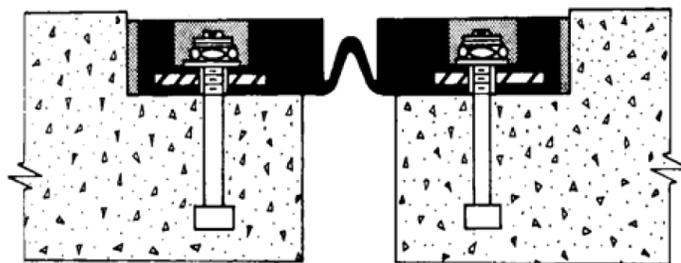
Sheet seal expansion joint. (Yuen 2005)
